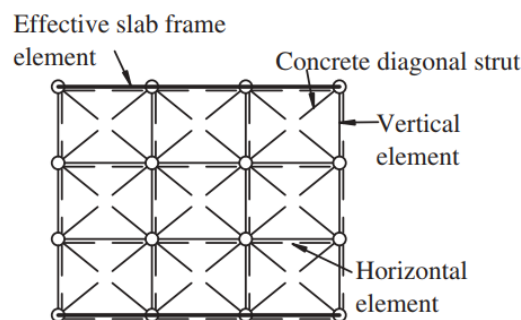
Nonlinear Truss Model (NLTM) representing an RC wall and framing slab (Panagiotou *et al.*, 2012)
